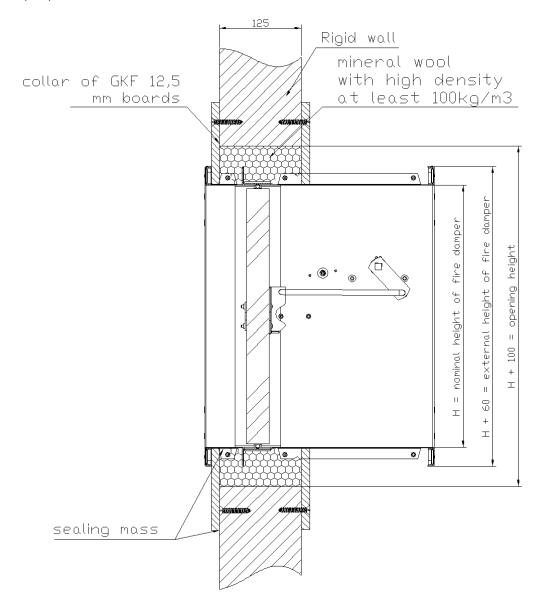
Installation method of fire dampers KWP-L in rigid wall
